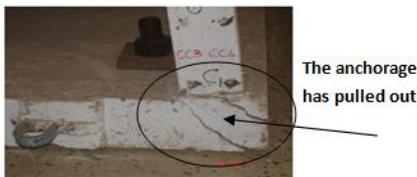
(f): Cracks in foundation-Column C1 joint
